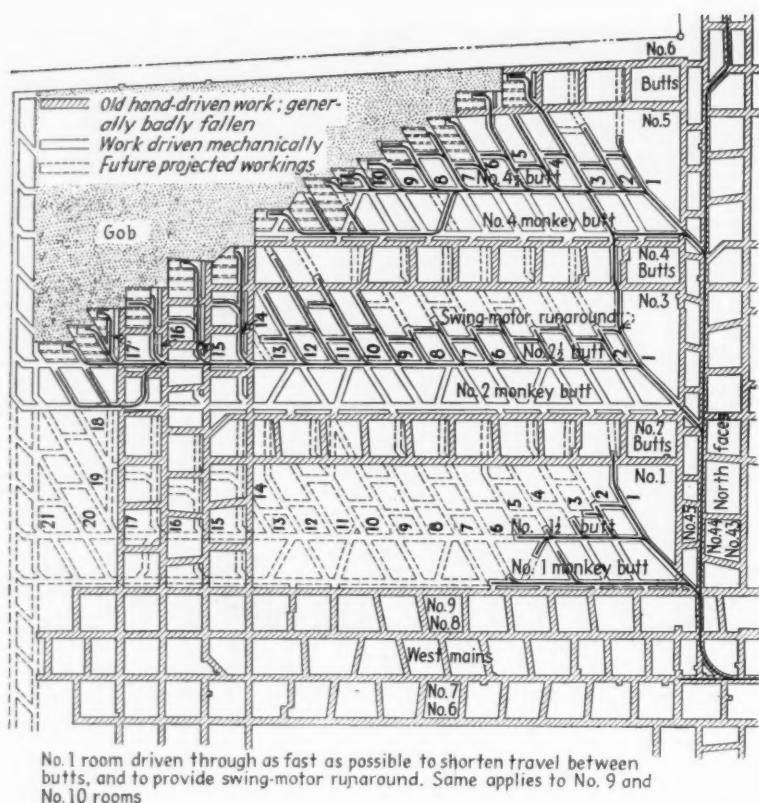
Working section in Isabella mine, showing typical 30-deg. rib line, method of driving "monkey butts," and track layout.
